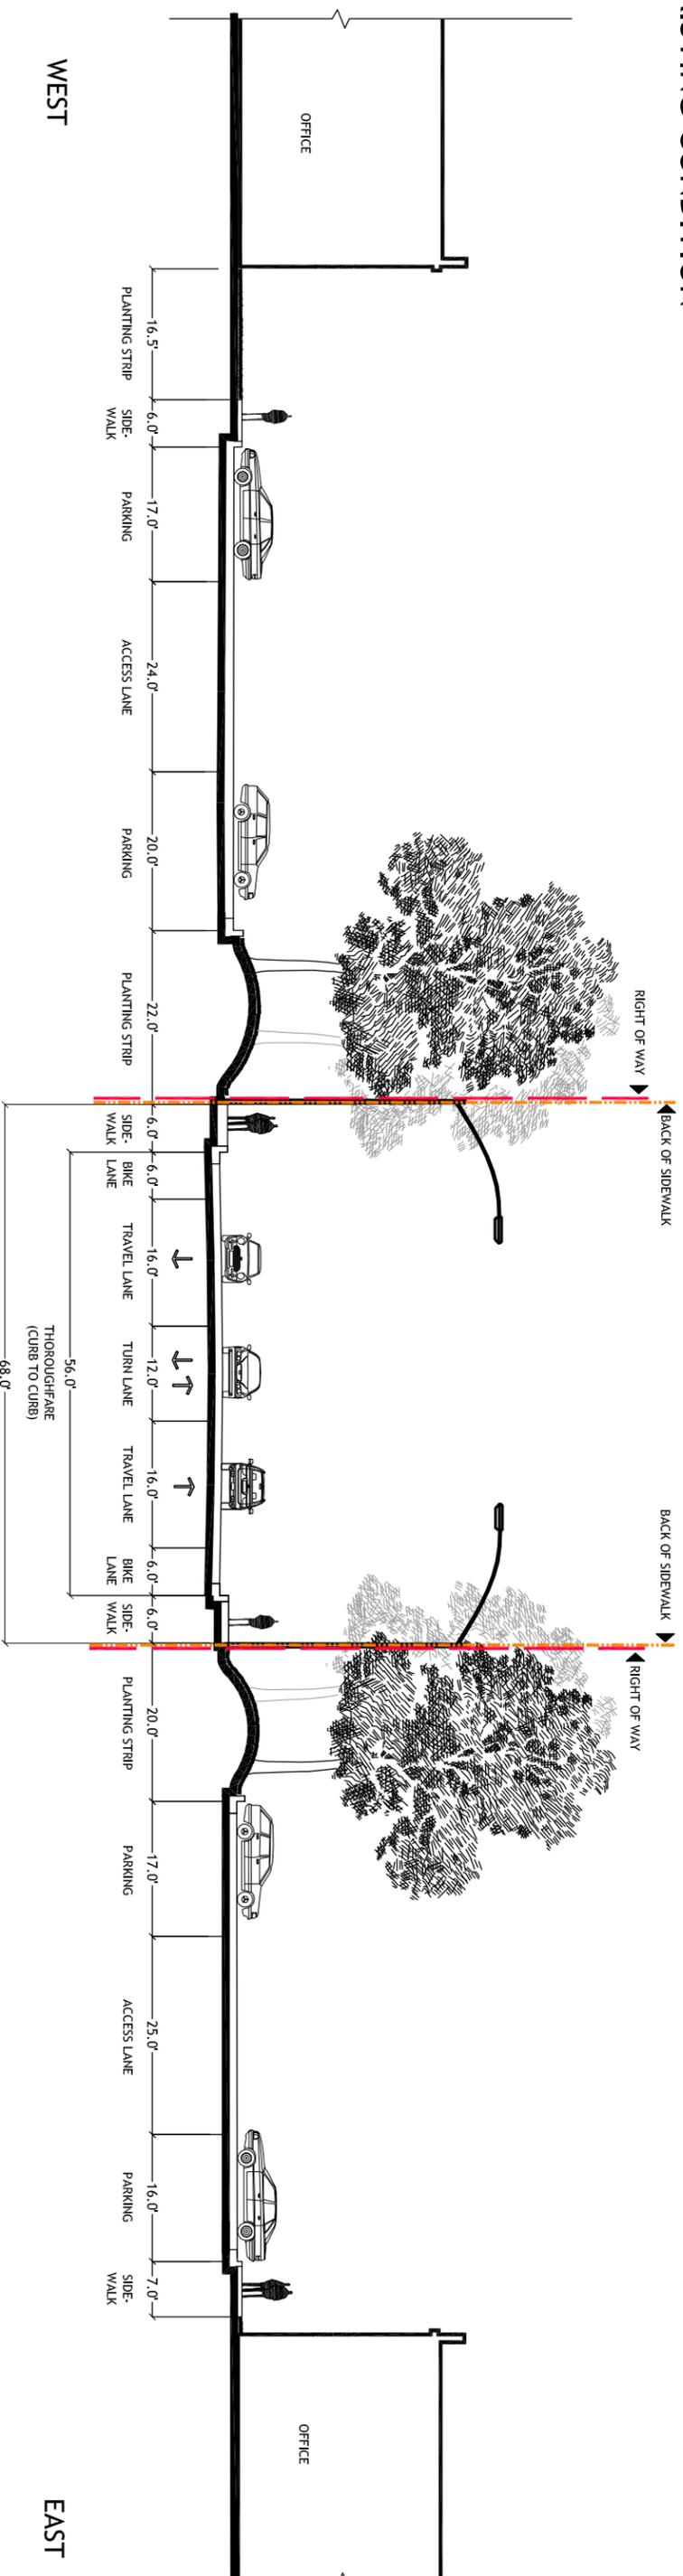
McCandless Drive in Pedestrian Retail Area
